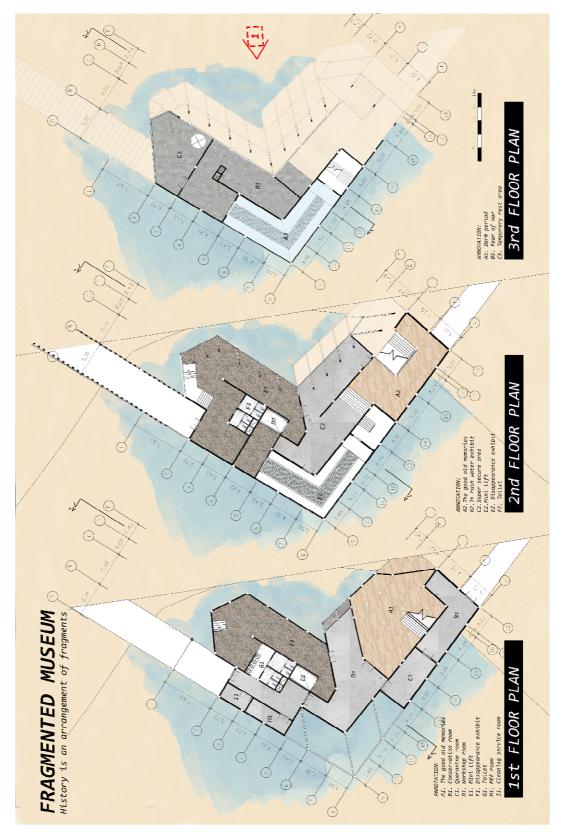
Fragmented Museum's Floor Plan (source : *author's illustration*)
